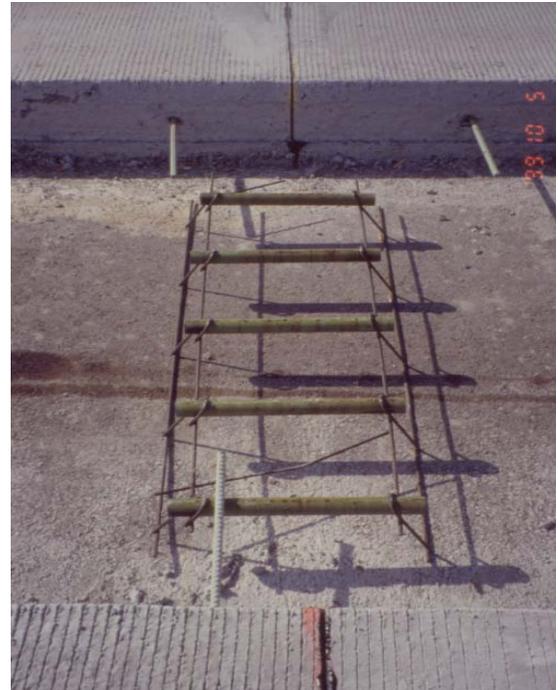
Tie bar placed over a dowel bar at a transverse joint (SR 195, Mile Post 44.40 to Bridge 195/34 PCCP paving project).
